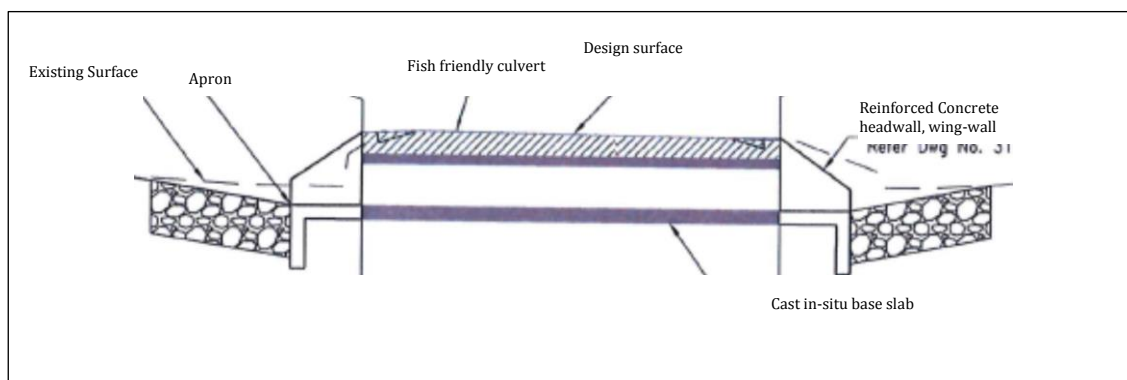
TYPICAL CROSS-SECTION FOR SECTION D (WITH CULVERT) [19]
